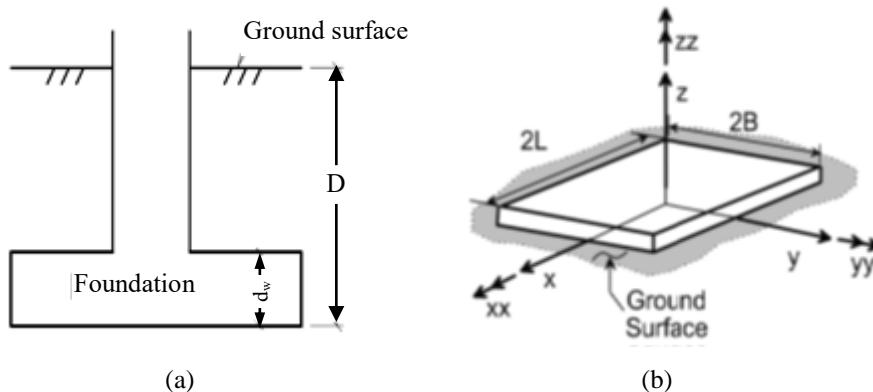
Schematic demonstration of foundation: (a) rigid foundation embedded within the half-space, (b) rigid foundation at the surface of the ground (half-space)
